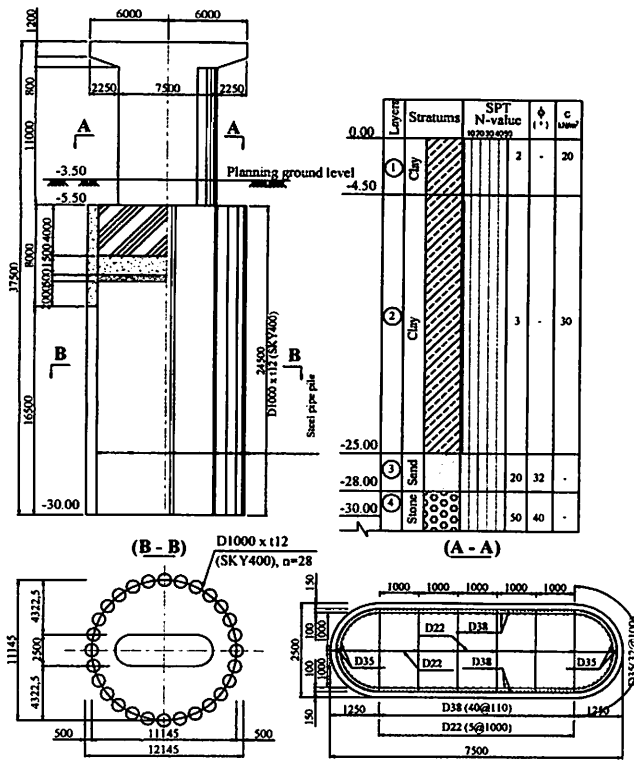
Prototype bridge pier with Steel Pipe Sheet Pile, foundation and soil properties
